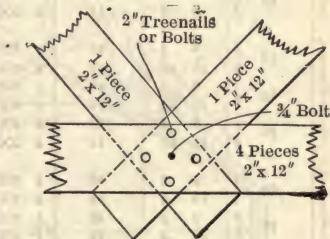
Lower Joint of Truss Shown in Fig. 19
